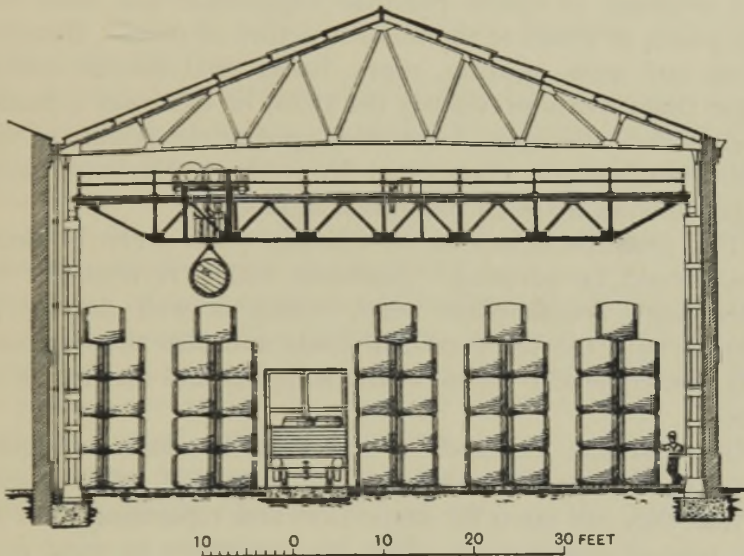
Traveller Stacking Hogsheads of Tobacco.
